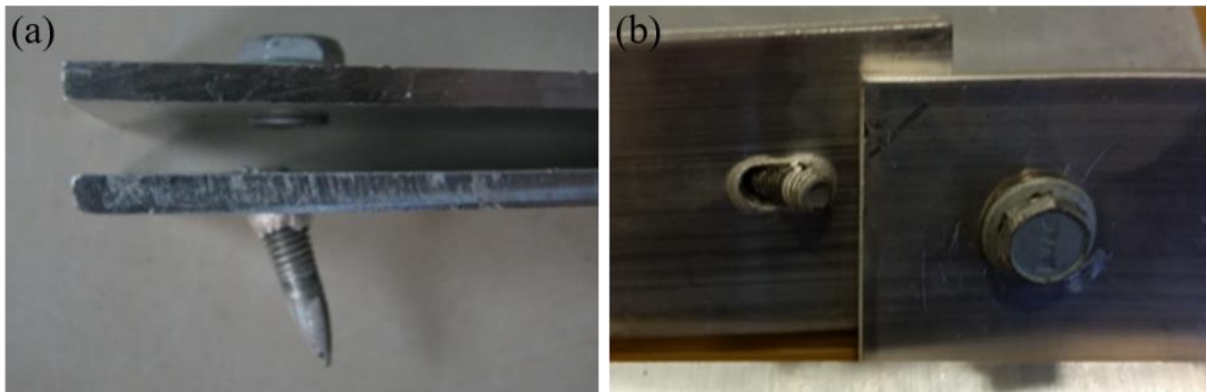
Screw fracture failure mechanism (a) side view, (b) top view
